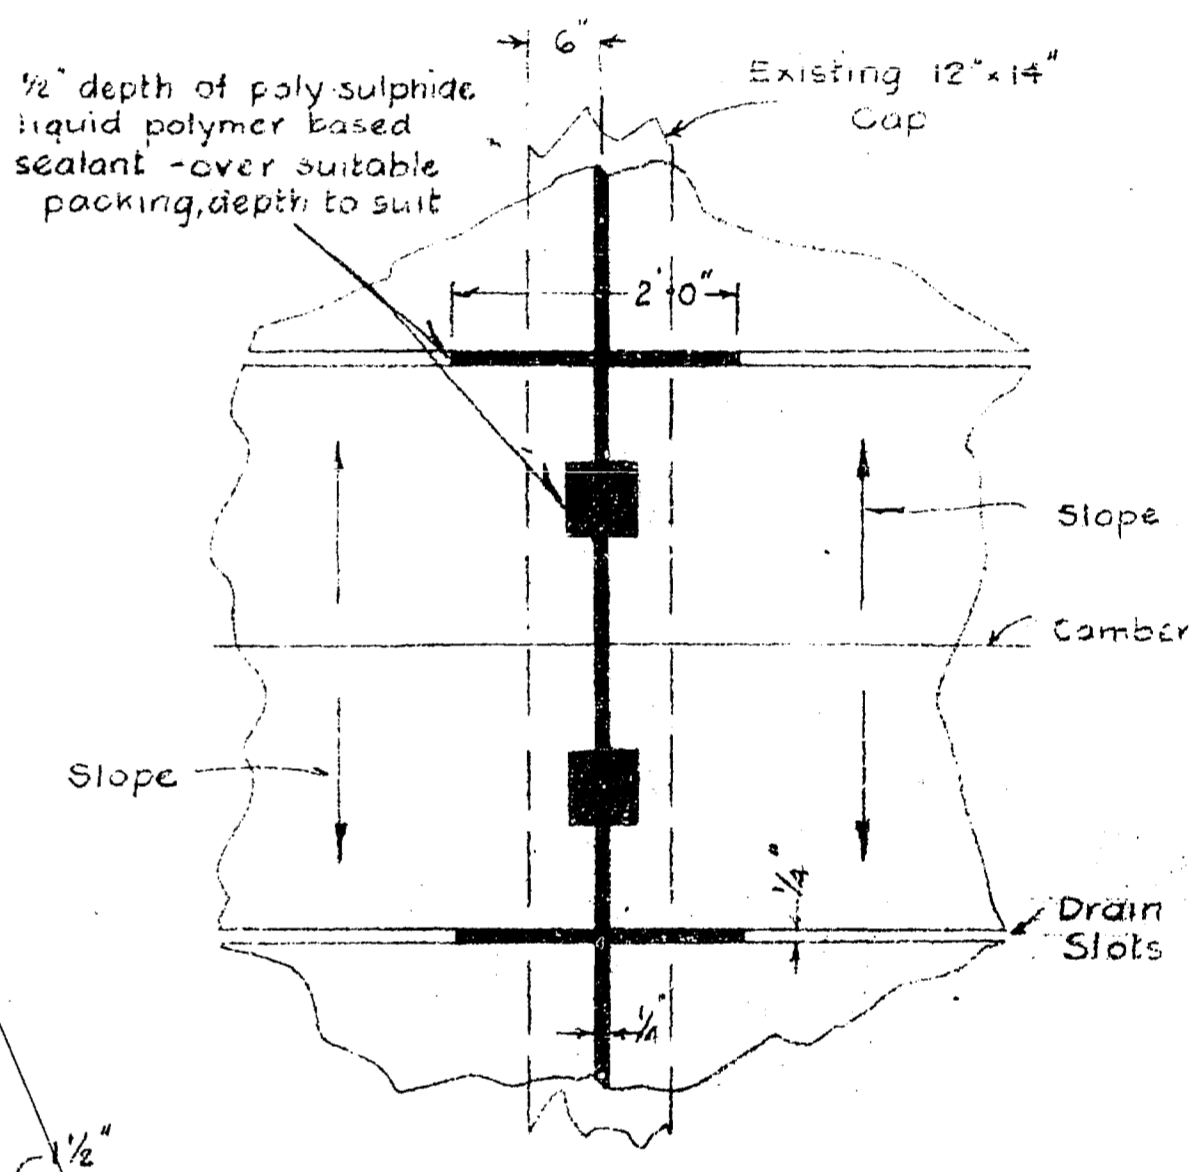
DETAIL OF JOINT FILLER & DRAIN SLOTS
